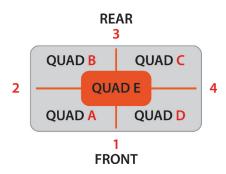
Interior and exterior identification shown on a plan view of a structure.
